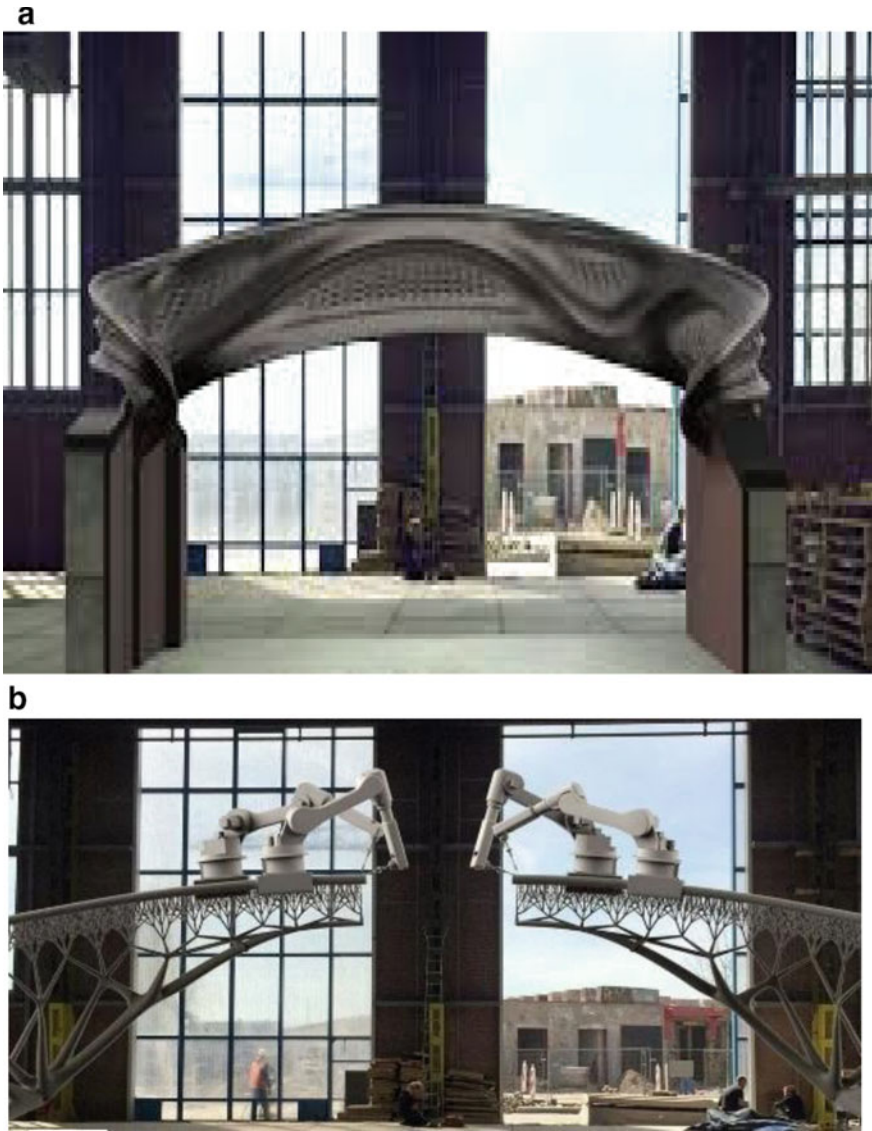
a MX3D bridge in Amsterdam (Hossain et al., 2020) b MX3D Bridge in Amsterdam (Hossain et al., 2020)
